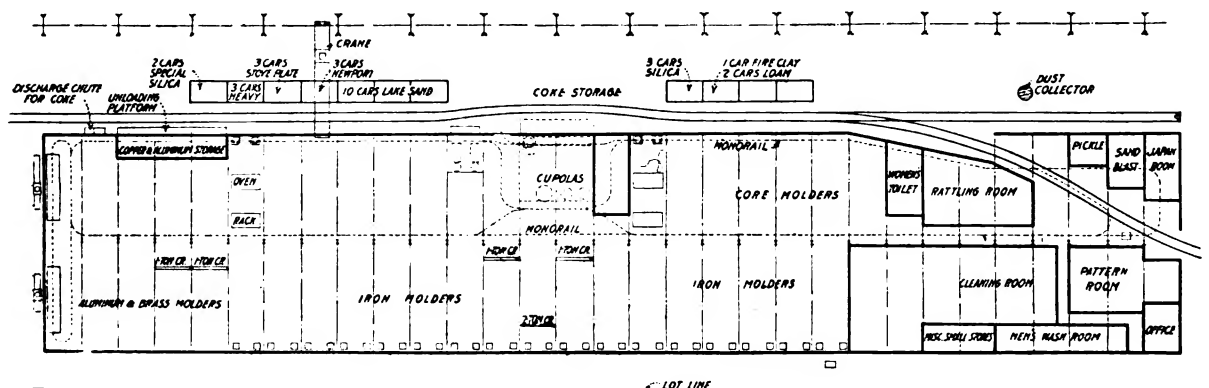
General floor plan of the new foundry of the Nash Motors Company, Kenosha, Wis.
